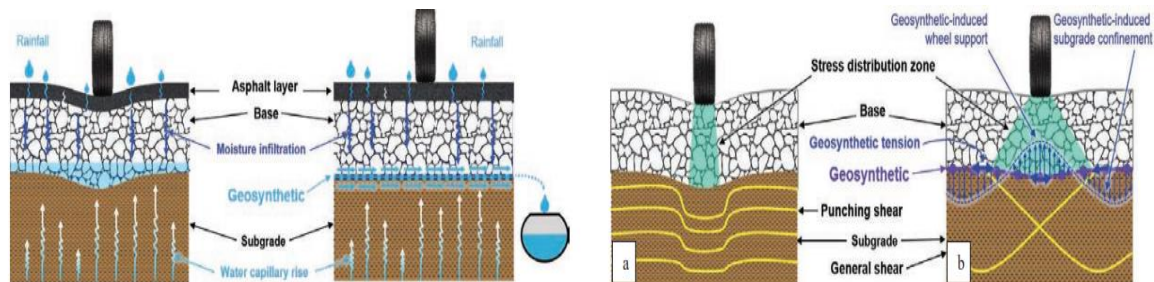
Horizontal Drainage [2]Figure 6. Stabilization of the Road Subgrades [2]
